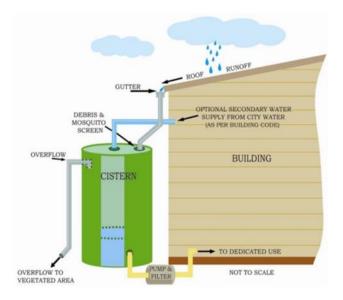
Rainwater Harvesting System Example (NCDEQ Stormwater Design Manual)
